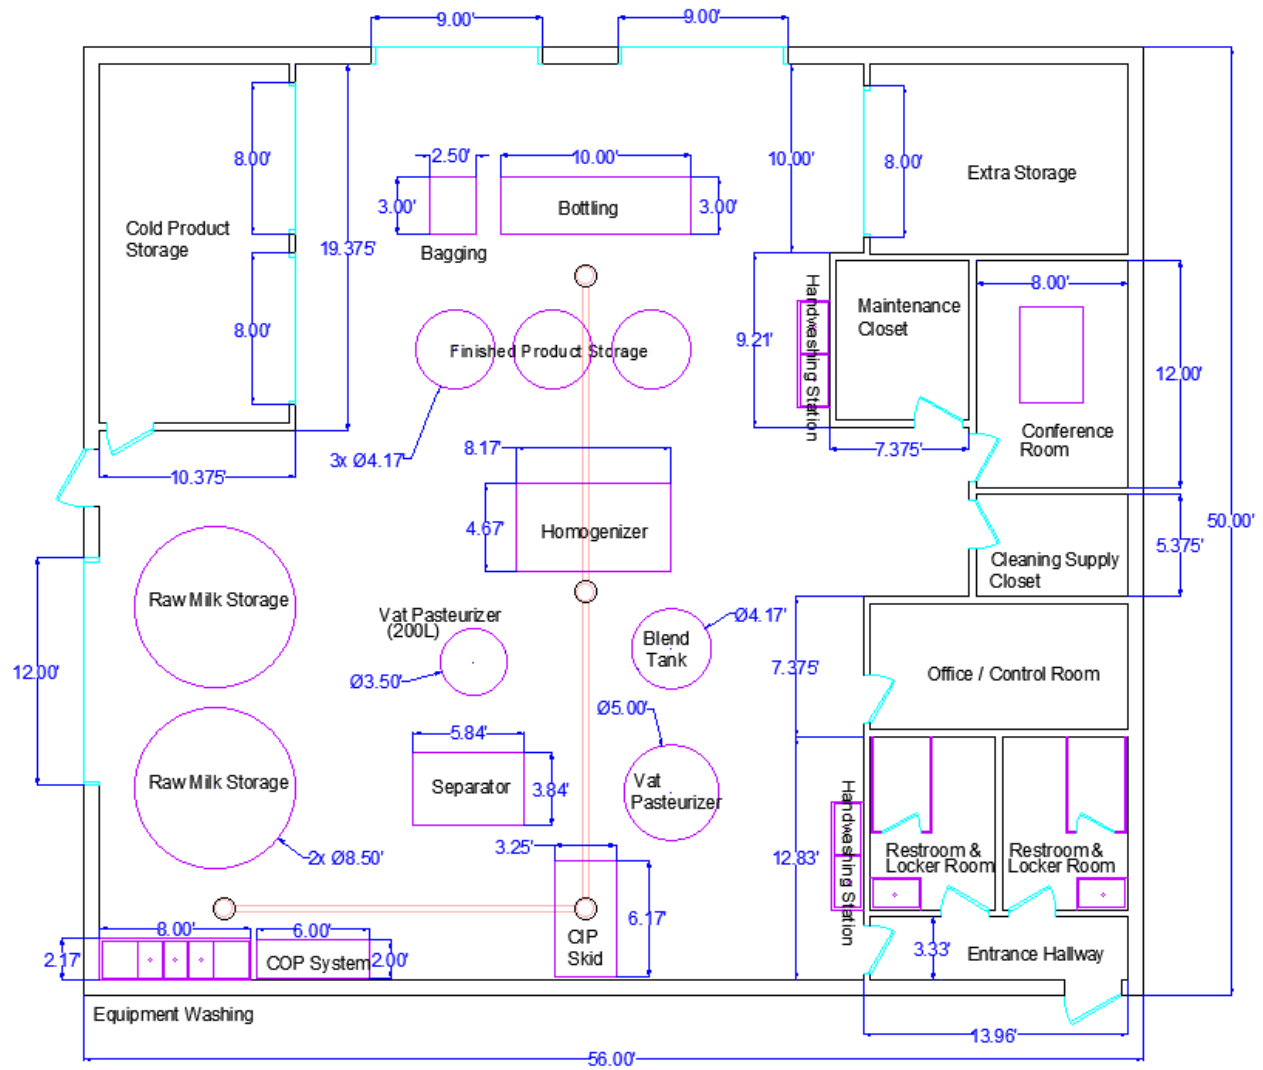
Dimensioned View of the Dairy Processing Plant Floor Layout
